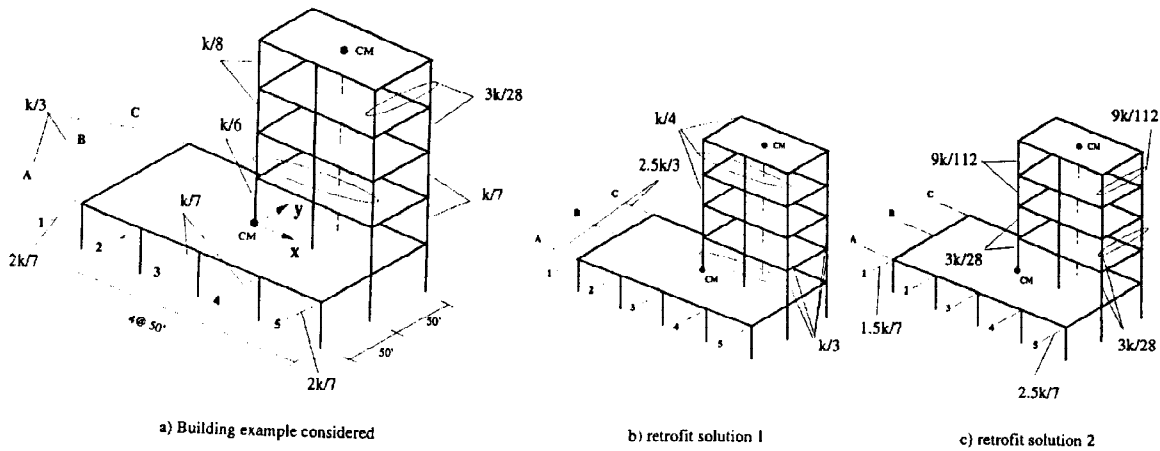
Building with Setback Considered in the Example and Two Possible Retrofit Solutions
